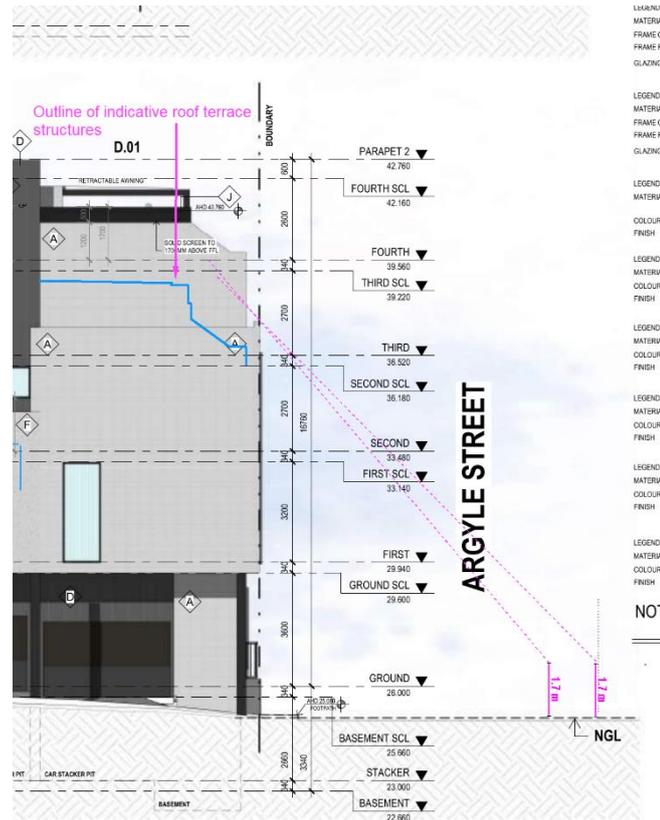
Sightlines from opposite side Argyle Street demonstrating approximate extent of visible built form of proposed development and result of condition to delete the proposed fourth storey.
